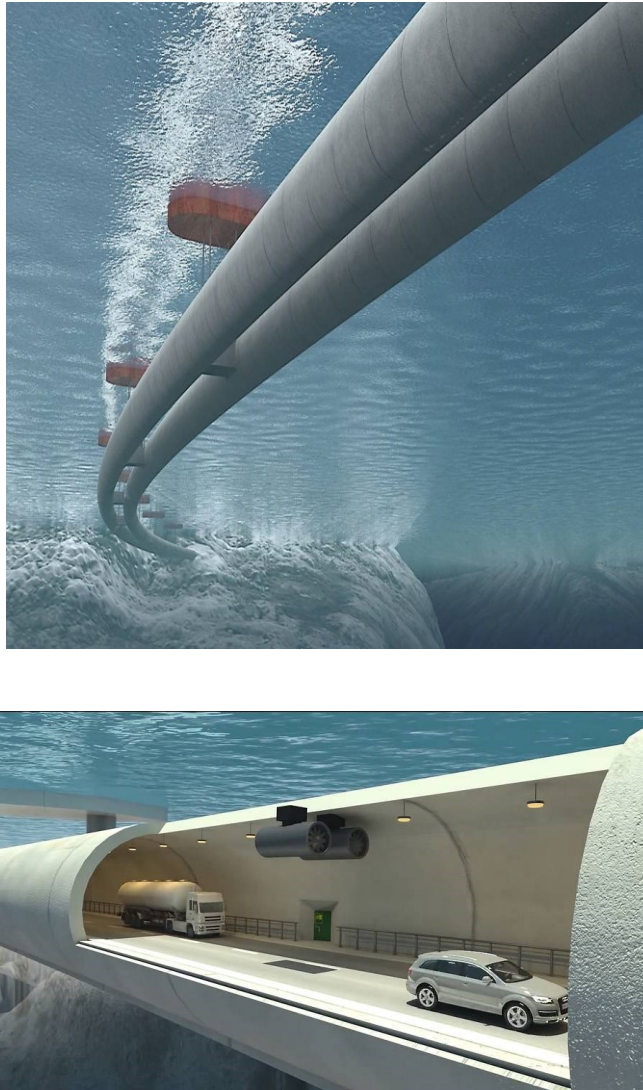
Example of submerged tunnel concept (Source: Norwegian Public Road Authorities).
